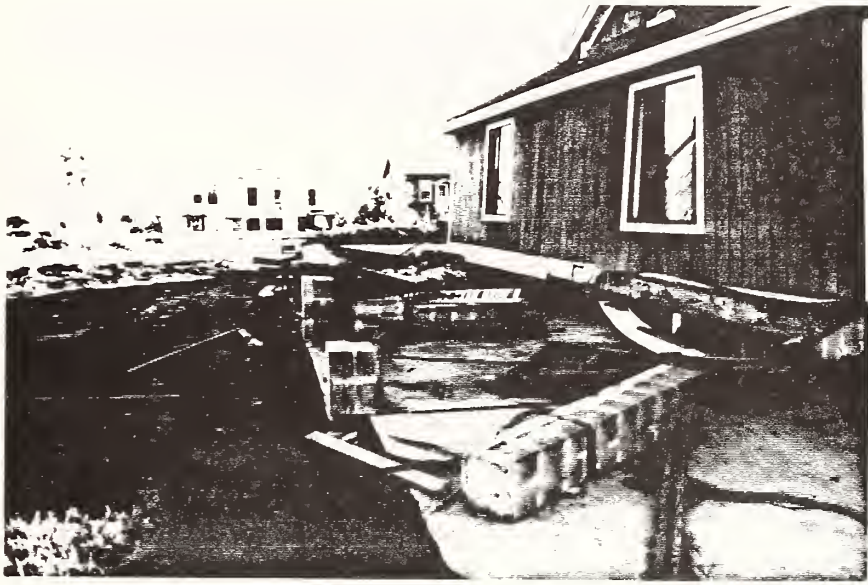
Masonry Pier Failure, Isle of Palms.
